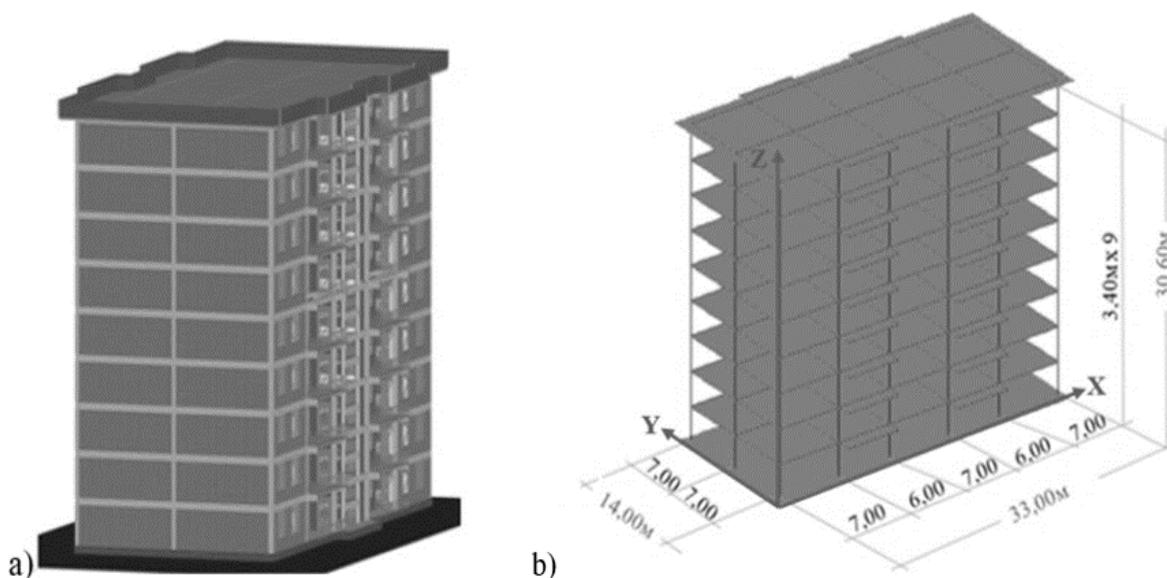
Design view (a) and overall dimensions (b) of the studied structural system with masonry infill walls
